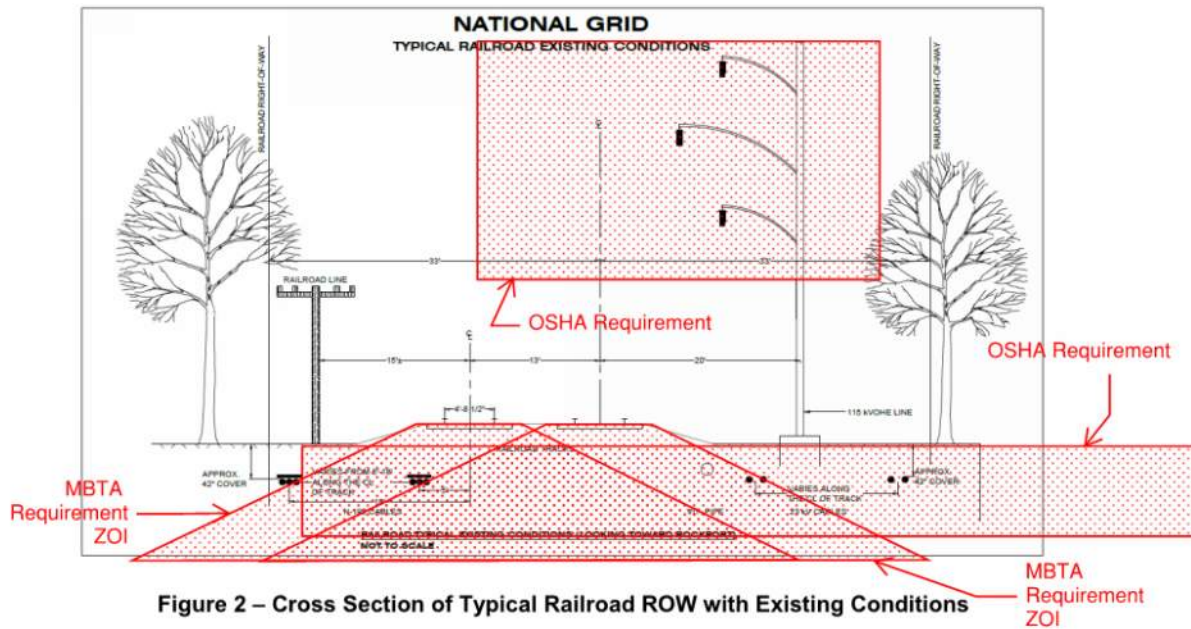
Cross Section of Typical Railroad ROW with Existing Conditions
